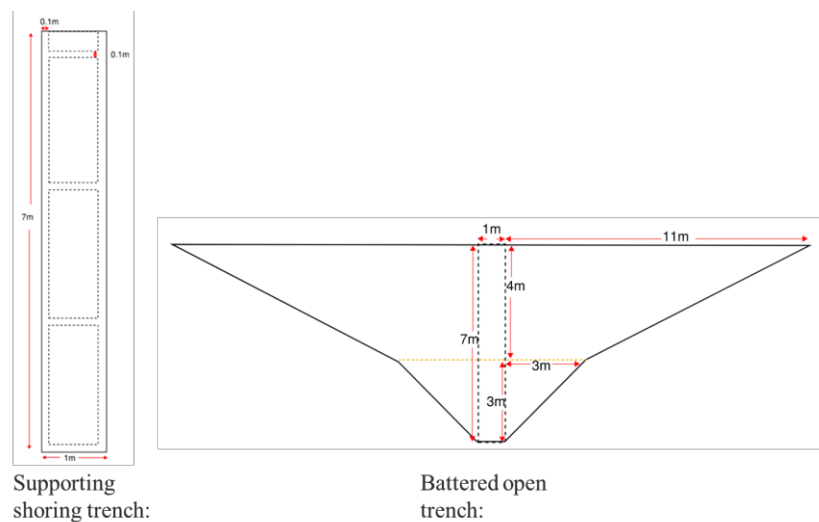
Trench cross-section showing possible excavation options for EC evaluation
